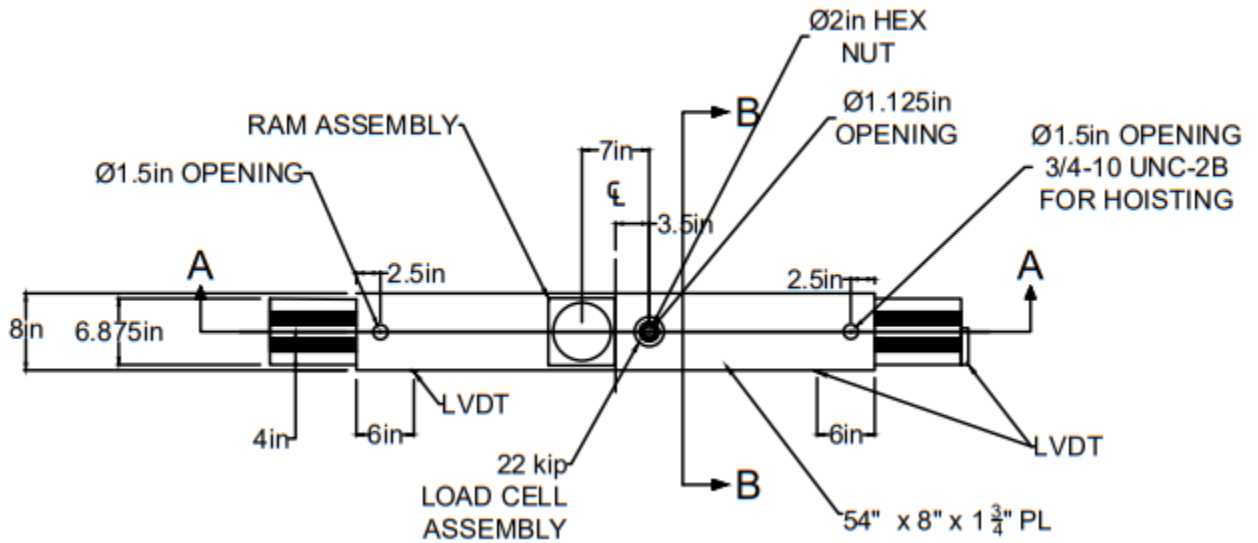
Plan view of CLT wall (credit: E. Baas)
